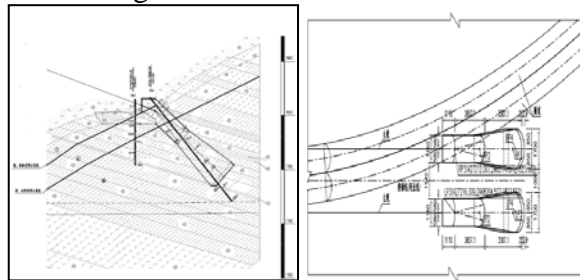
Geological vertical section of right bank and plane relationship diagram between tunnel and tunnel-type anchorage
